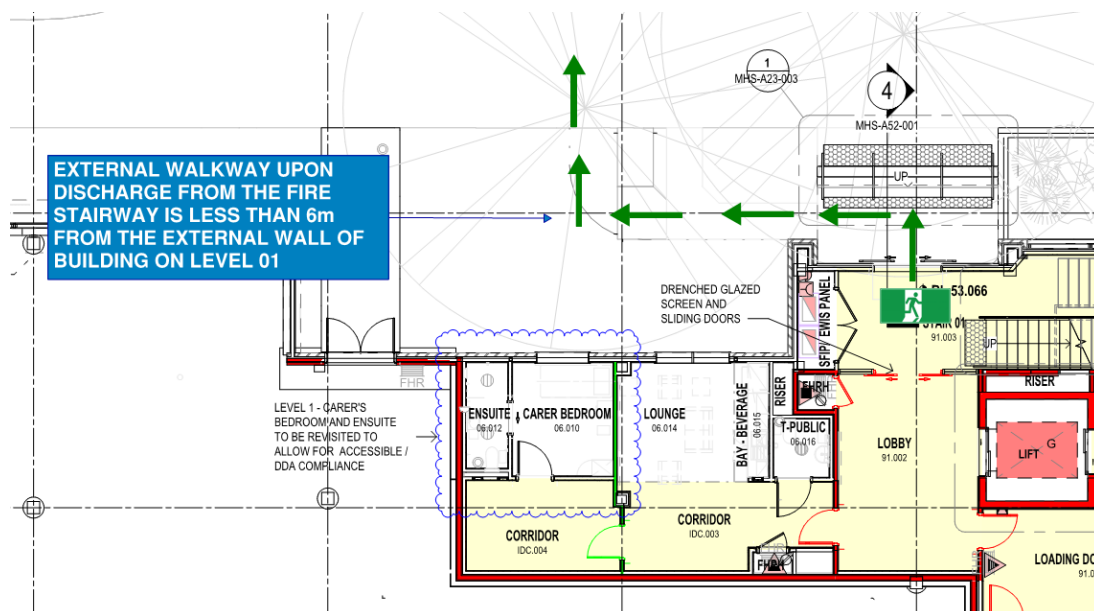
External pathway located within 6m of the external wall and openings to the Class 3 accommodation
